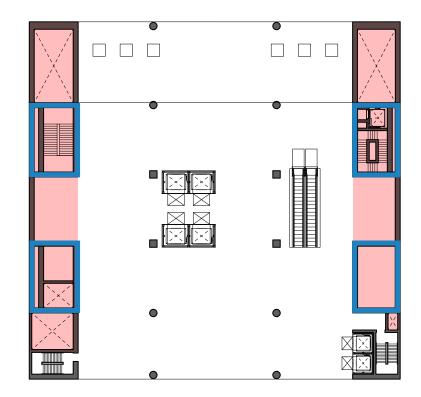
BART Lobby Floor Plan with Escalator Access
